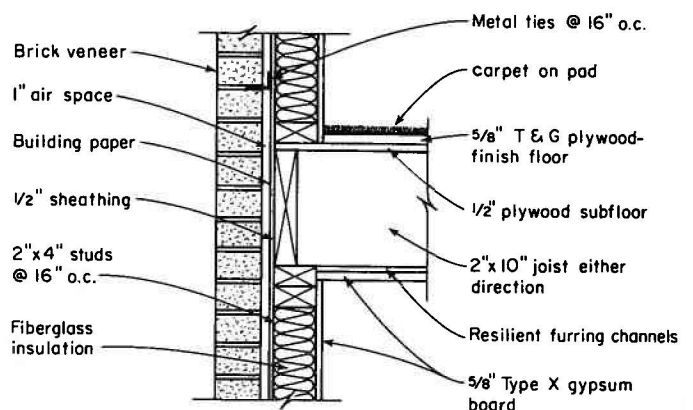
Wood-joint floor and composite wall of wood-frame structure (Building 1).
